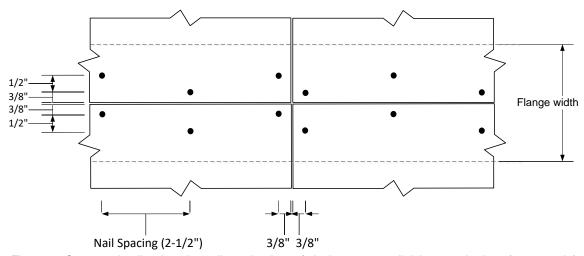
Staggered nails when the nail spacing is 2-1/2 inches o.c. at adjoining panel edges (not to scale)
